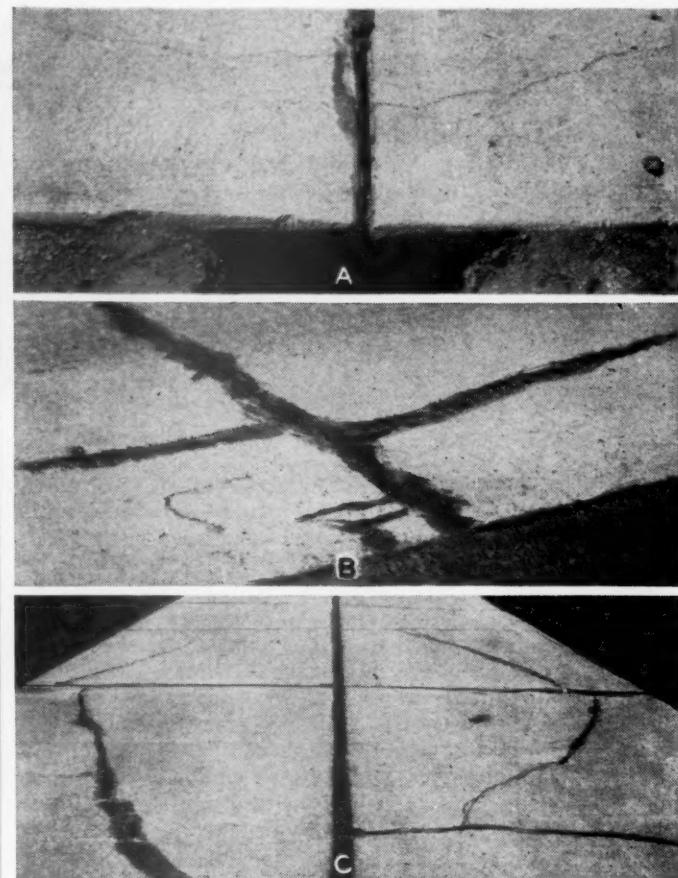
A, INFILTRATION CRACK IN EARLY STAGE OF DEVELOPMENT IN REINFORCED PAVEMENT; B, TYPICAL INFILTRATION CRACK; C, TYPICAL INFILTRATION CRACKS THAT HAVE DEVELOPED TO A SERIOUS DEGREE.
